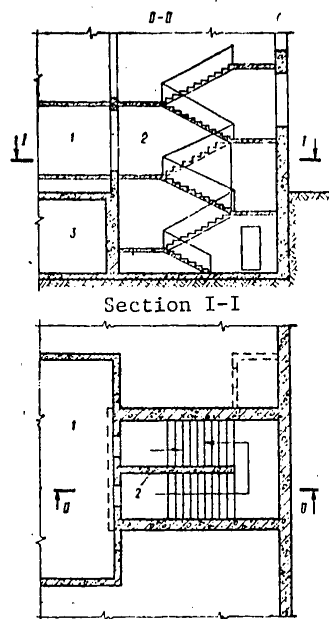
Entrance to shelter with DES from stairwell of multistory building
